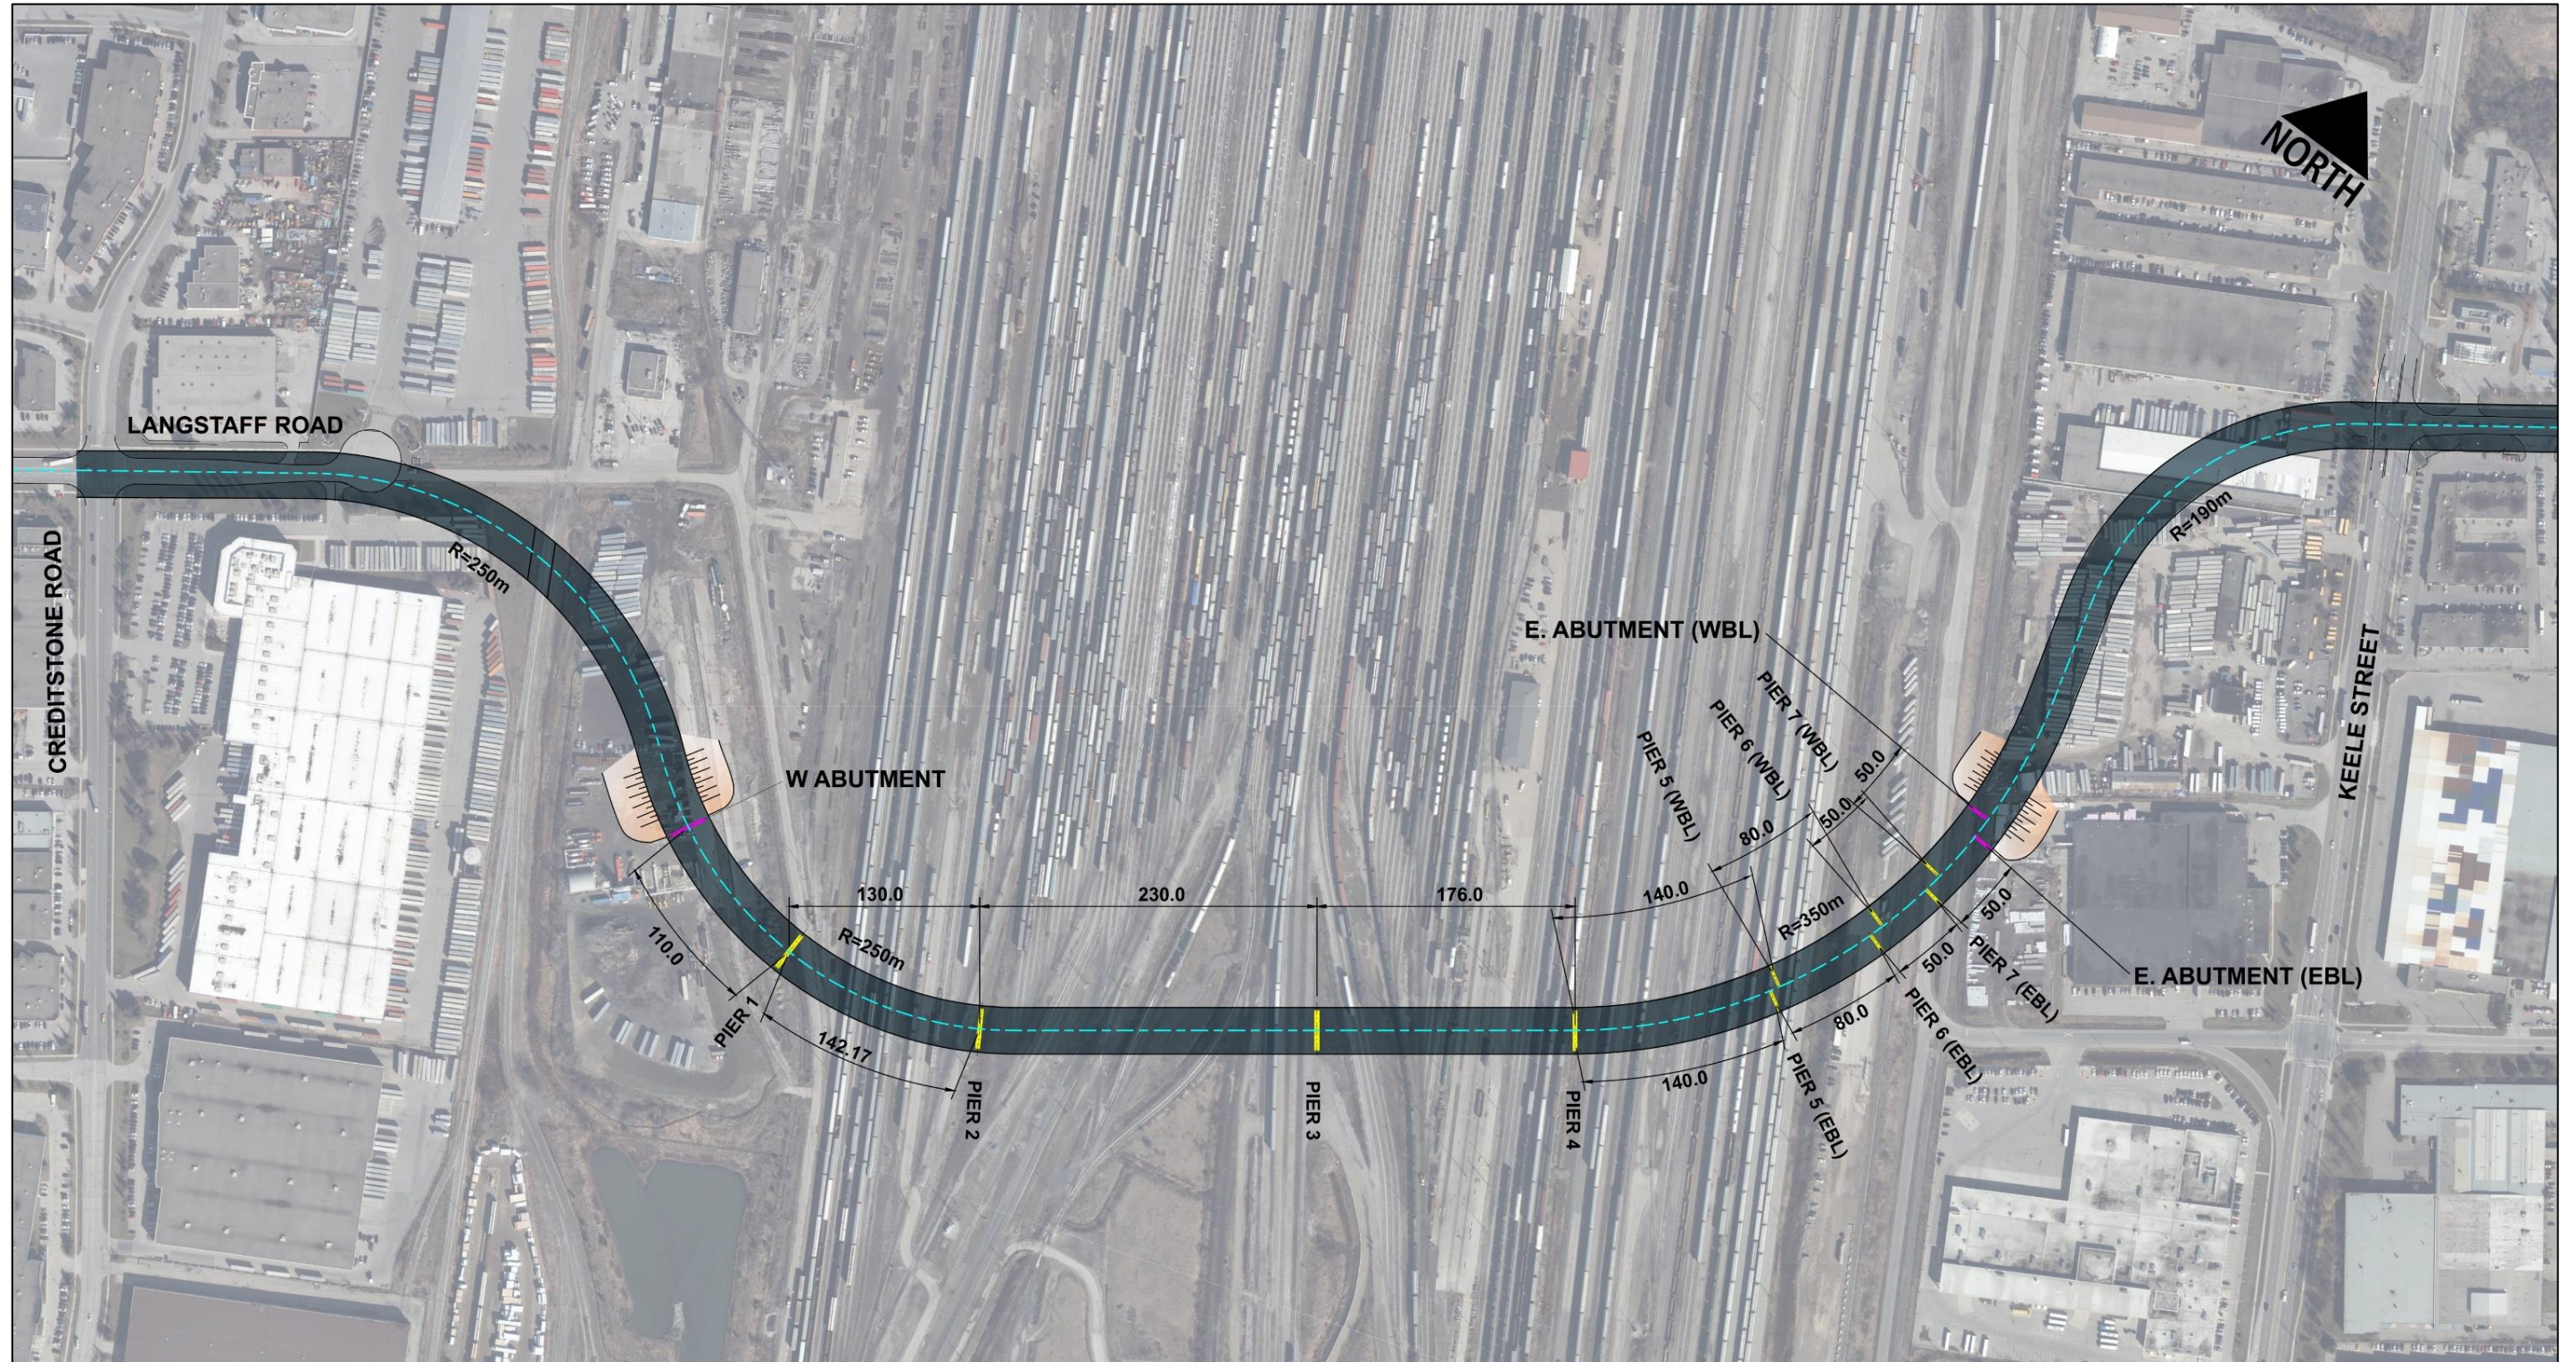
CN Crossing Alternative 3 – Post-tensioned Segmental Concrete Box Girder Bridge
